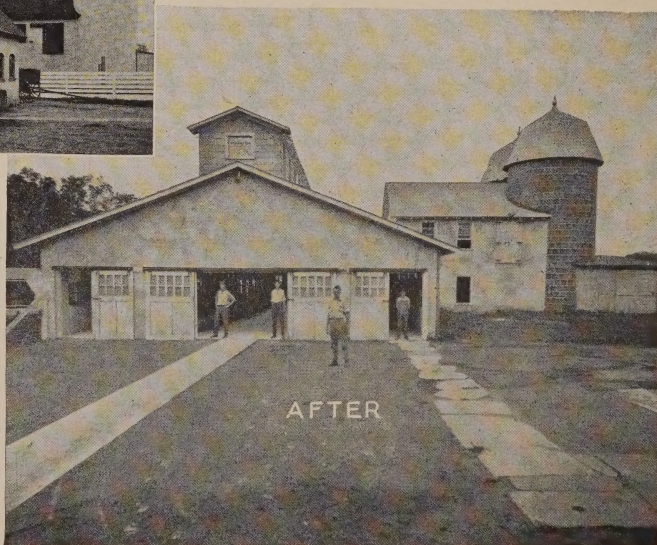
Barn at Vine-land, New Jersey, Training School—the illustration marked "before" shows frame structure which burned down in a single hour. Illustration marked "after" shows new concrete fireproof barn replacing the one burned down. Notice advantages of concrete sidewalk at left, as compared with flagging at right.
